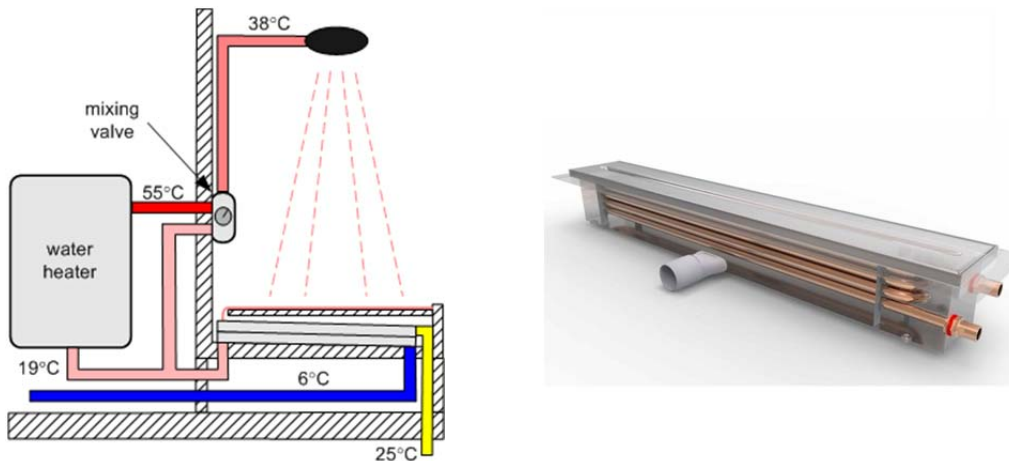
Shower platform with integrated DWHR (<http://www.heatsnagger.com>)
